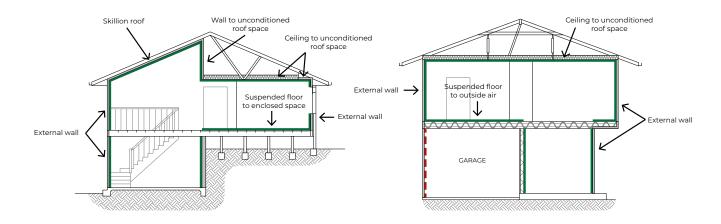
Class I examples of steel frame building elements that require thermal bridging to be modelled outlined in solid green lines (as opposed to the dashed red line).
